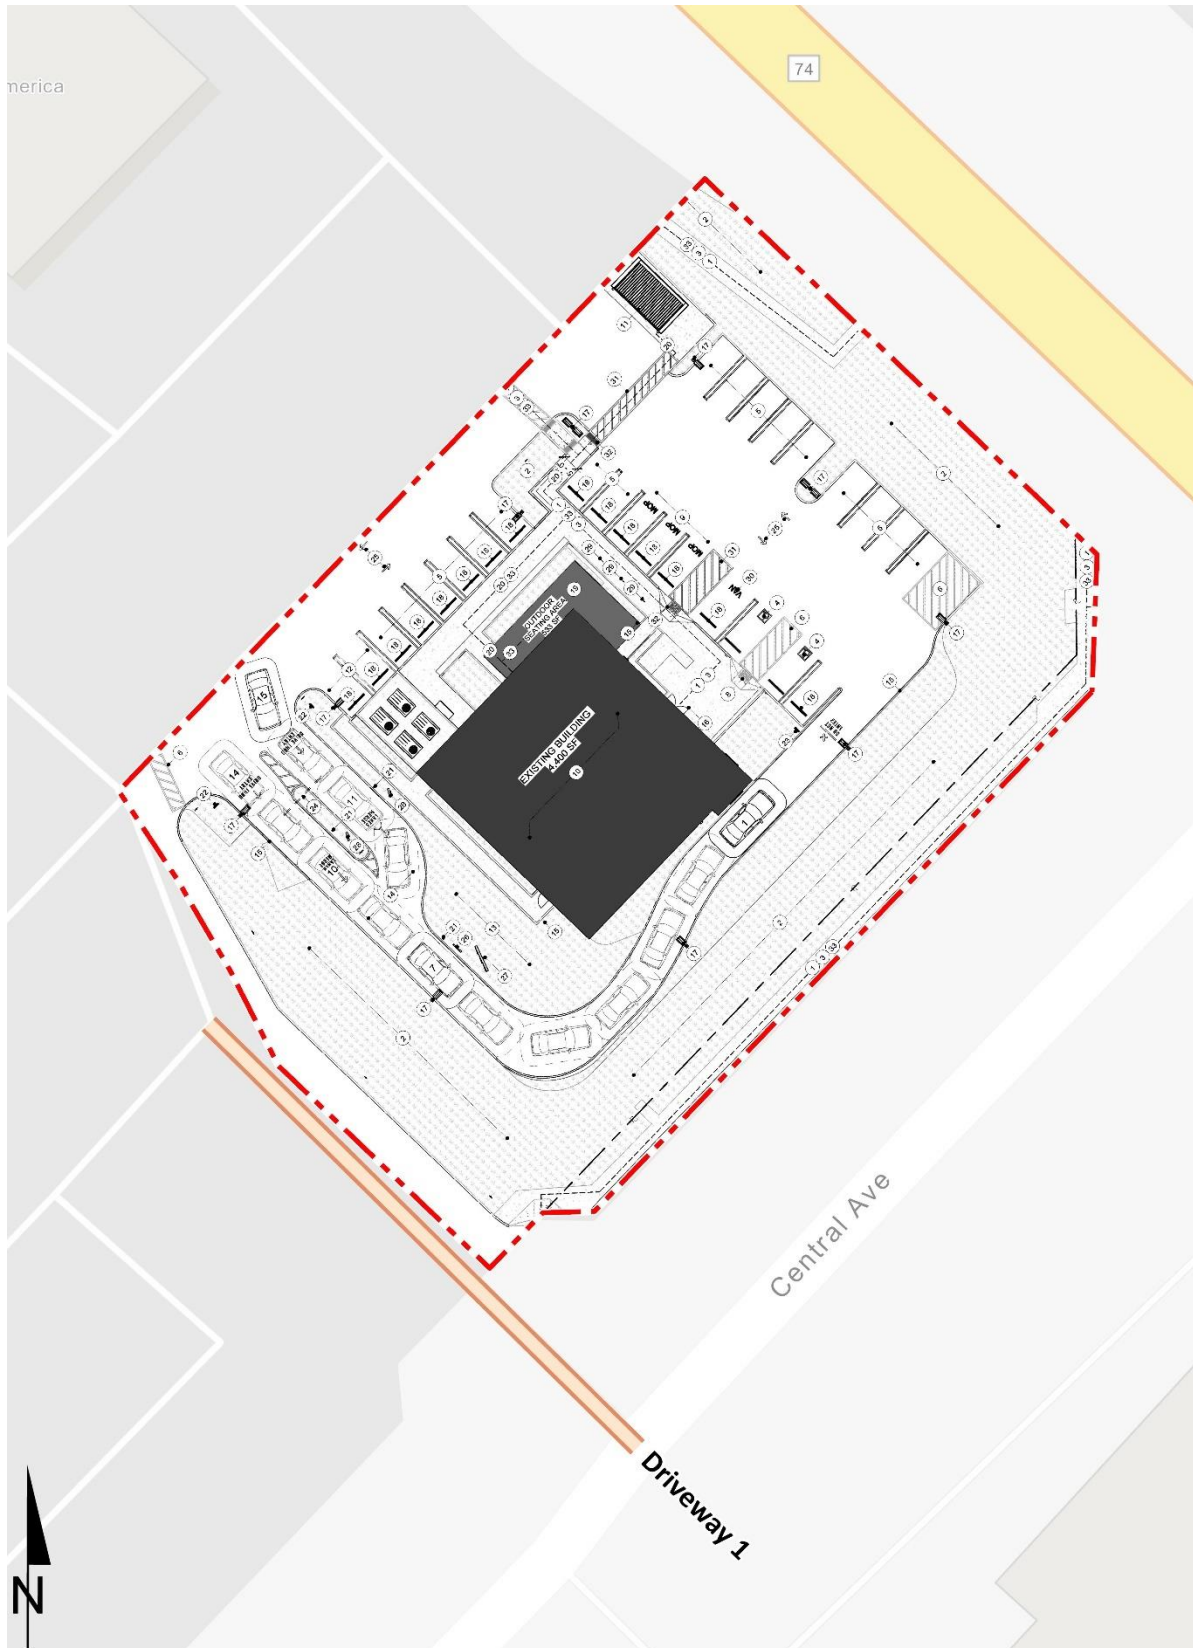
PRELIMINARY SITE PLAN
